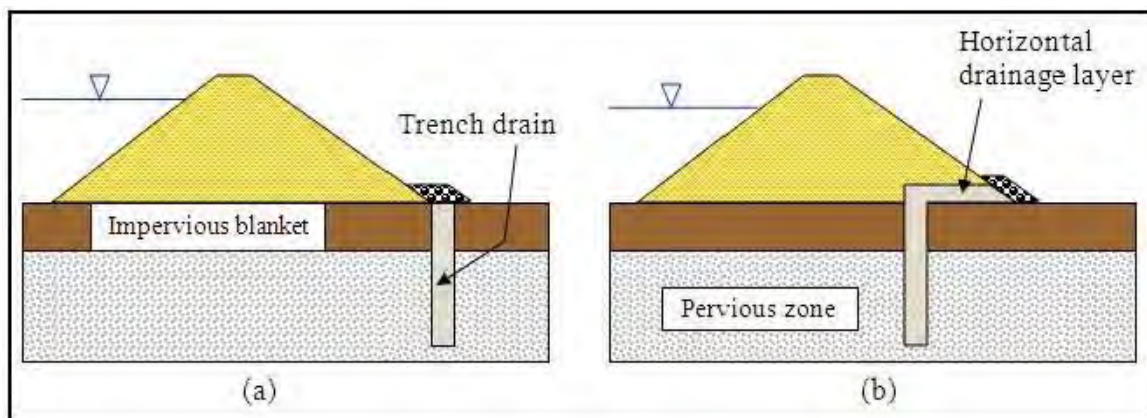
Typical trench drain details – (a) drain at downstream toe of dam; (b) drain under downstream slope of dam with horizontal drainage layer (after USACE1993).
